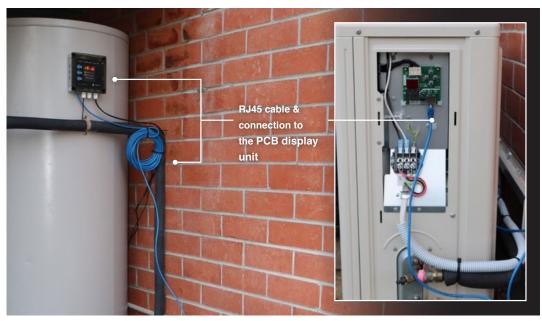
Wiring of RJ45 cable from controller to the PCB display unit.
